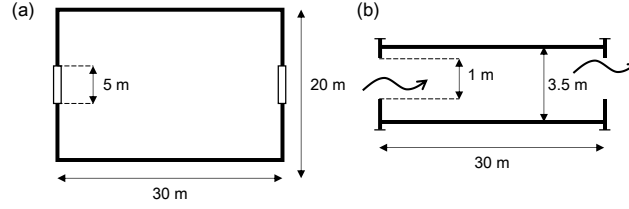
Geometry of a typical floor. (a) Floor plan; (b) cross section.
